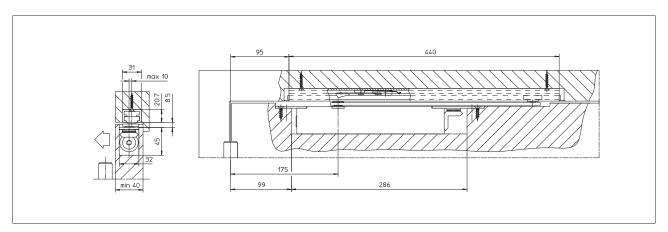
· GEZE Boxer size 2-4 with guide rail Boxer with mechanical hold-open
